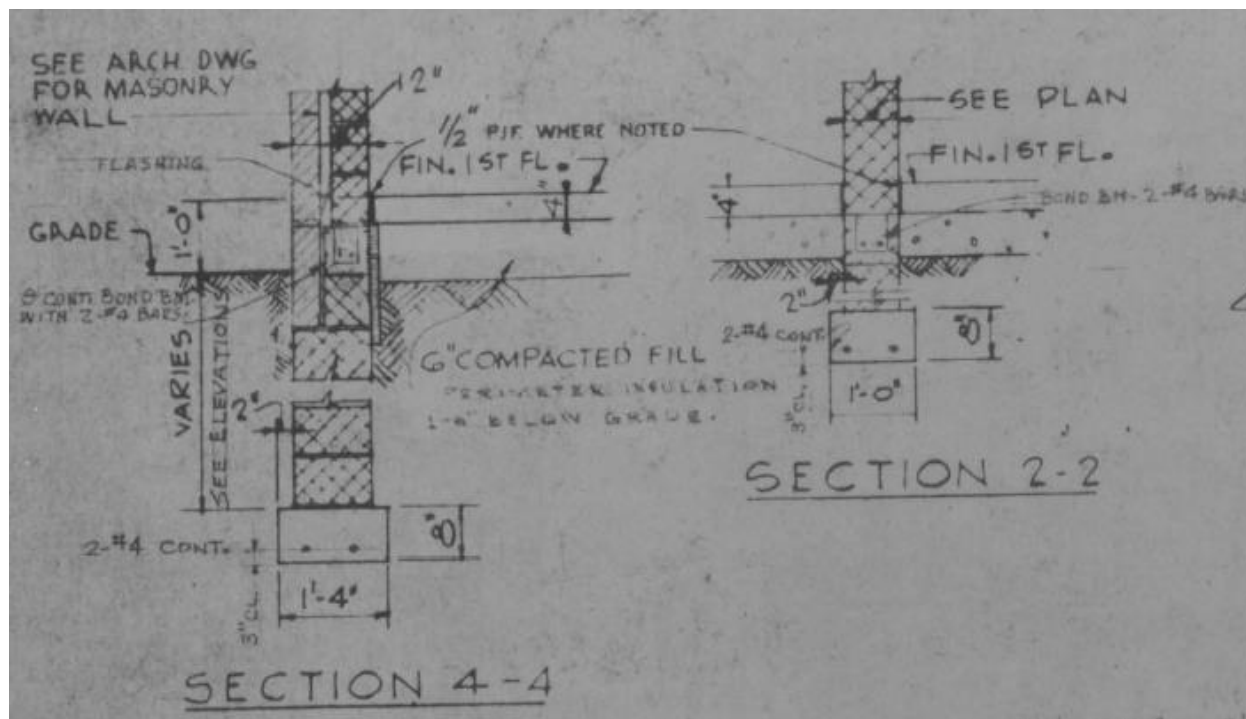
Design Details for Perimeter and Interior Walls and Foundations (c. 1955)
